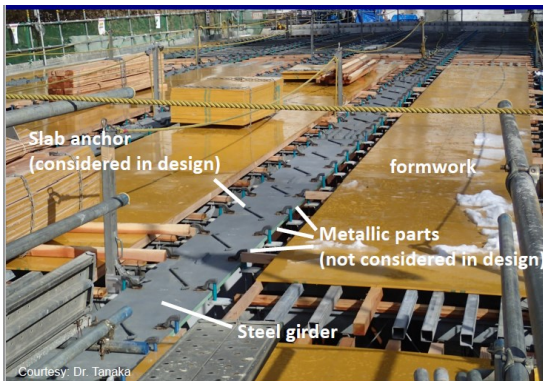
Metallic connectors and slab anchors provide external restraints against RC deck slab[5]
